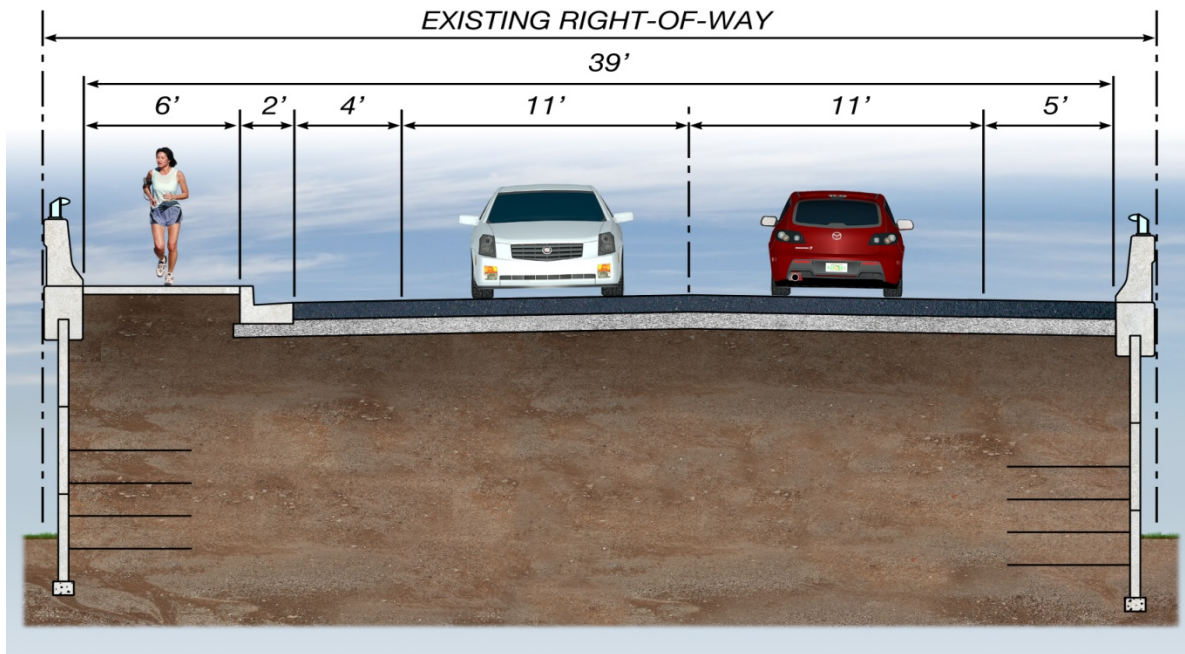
Proposed Roadway Section West of Proposed Fixed Bridge
